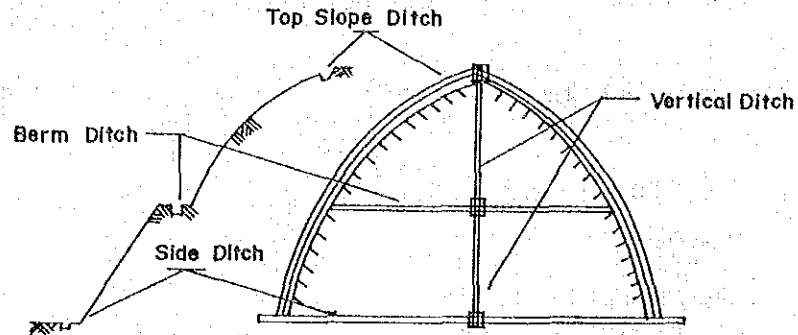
LOCATION OF SLOPE DITCH
